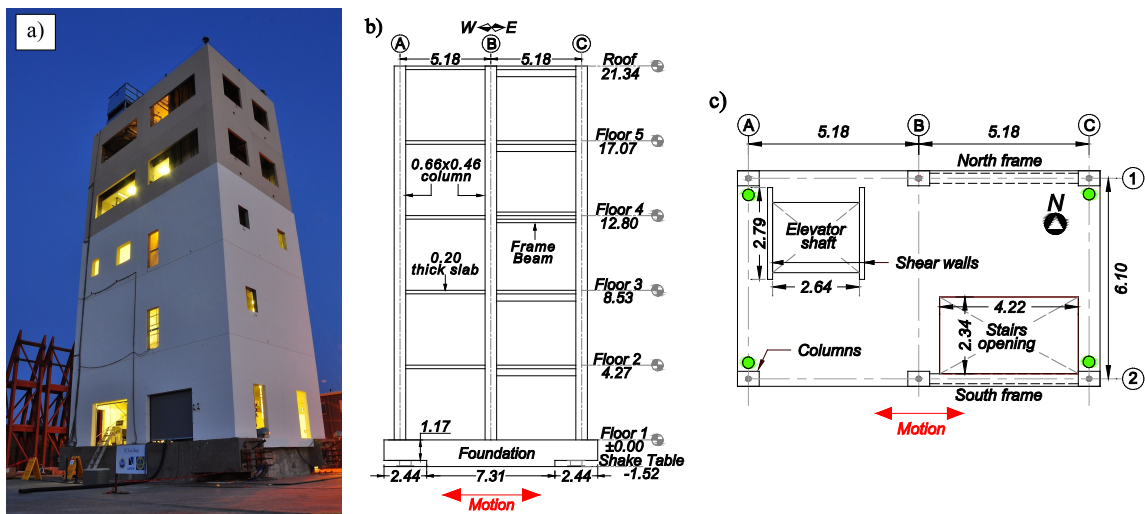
Building specimen: (a) completed building, (b) schematic elevation view, (c) schematic plan view. (all dimensions in m)
